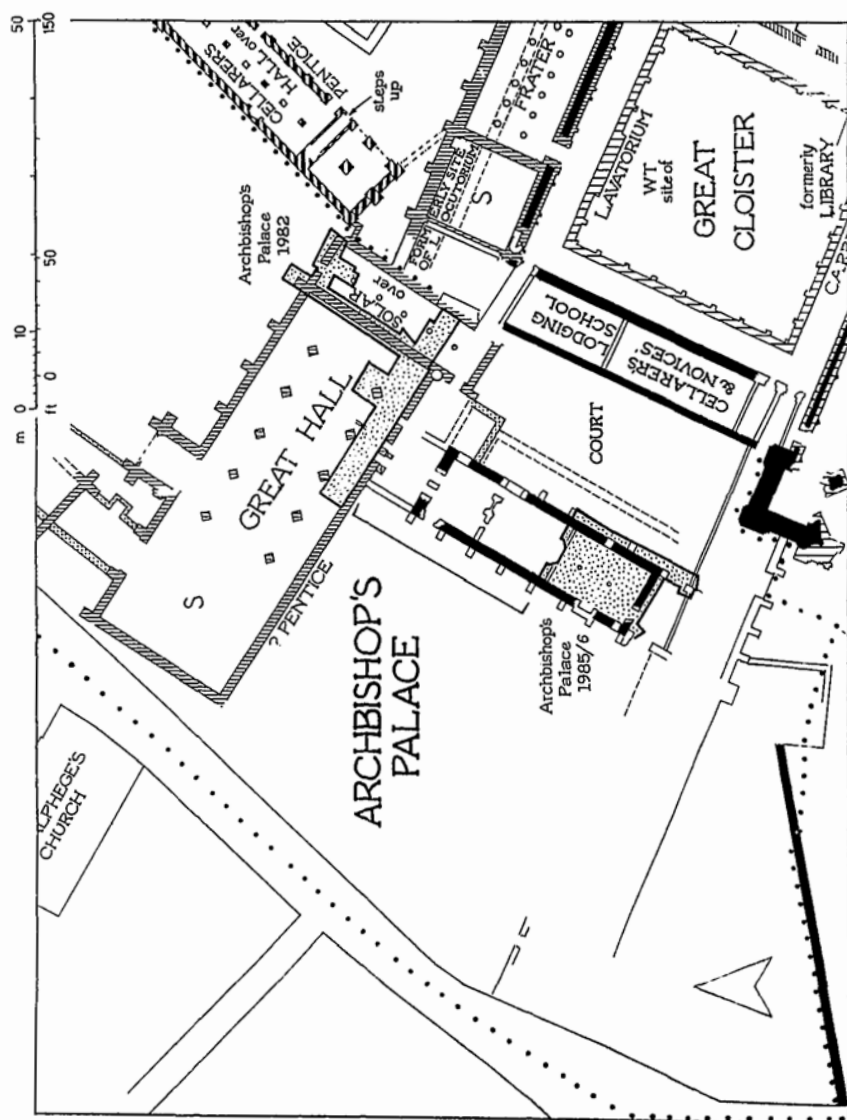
Location Plan for Excavation and Building Recording Sites.
